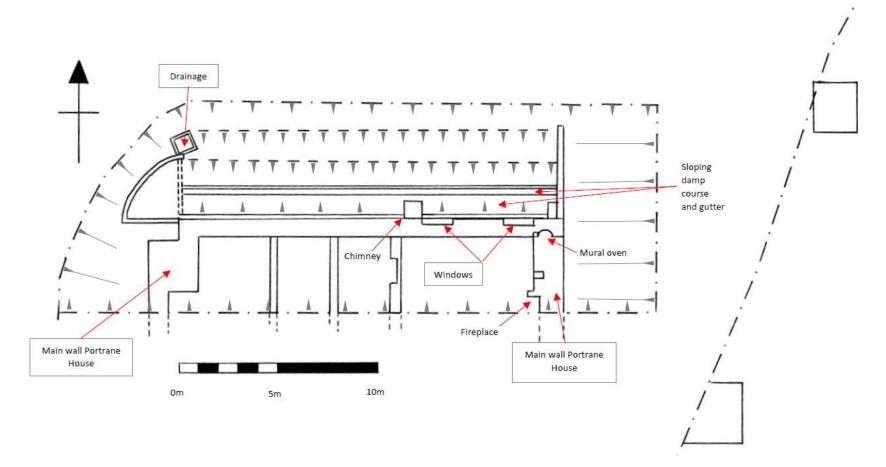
Area 3. Portrane House, basement level as excavated (2016)
